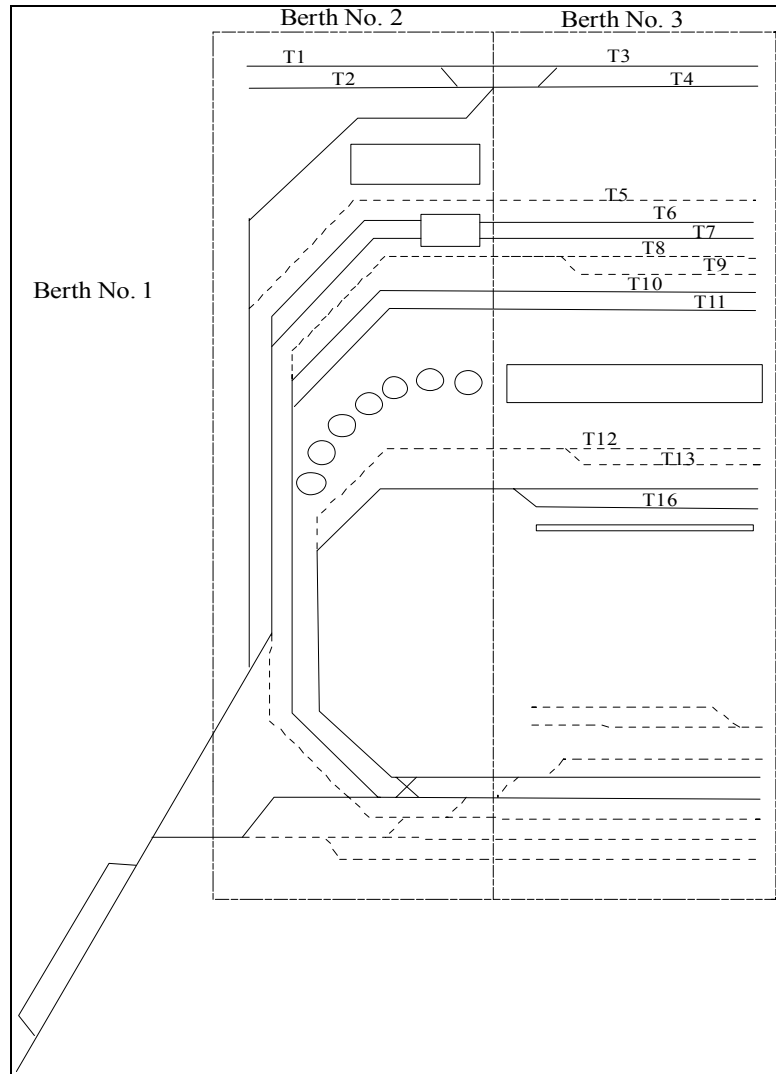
Track Layout Plan at Outer Port (2015)
